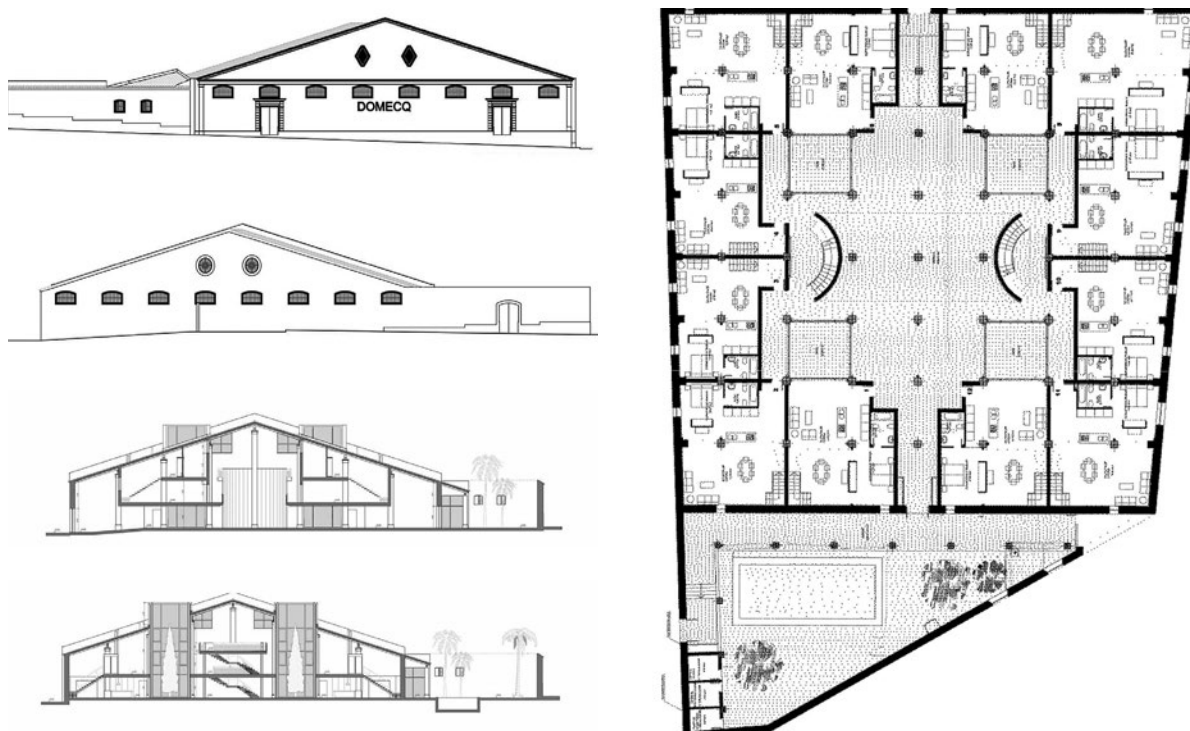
Floor plan, facades and sections of the converted bodega El Cantón (Sánchez, 2014, 41).
